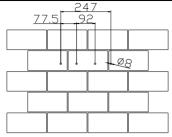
Drill holes' dimensions of SunUno Plus 2K/2.5K/3K (TR-xxxxM1)
